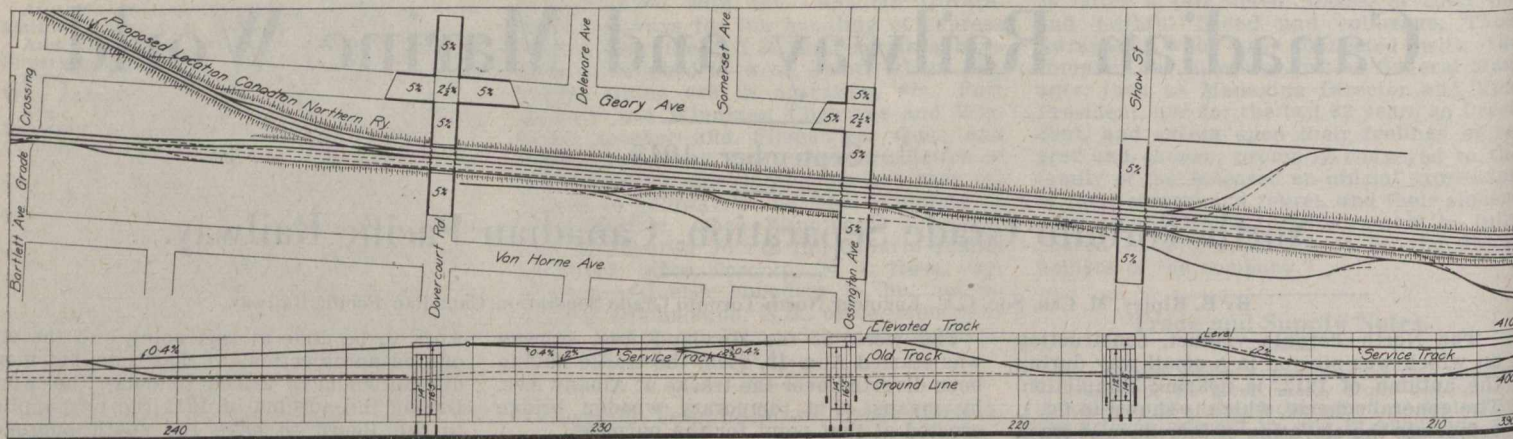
Plan and Profile of Track Elevation Across North Toronto.
